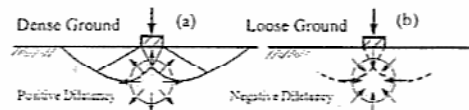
Illustration of shear failure pattern of surface footing. (a) general shear failure in dense ground, (b) local shear failure in loose ground
